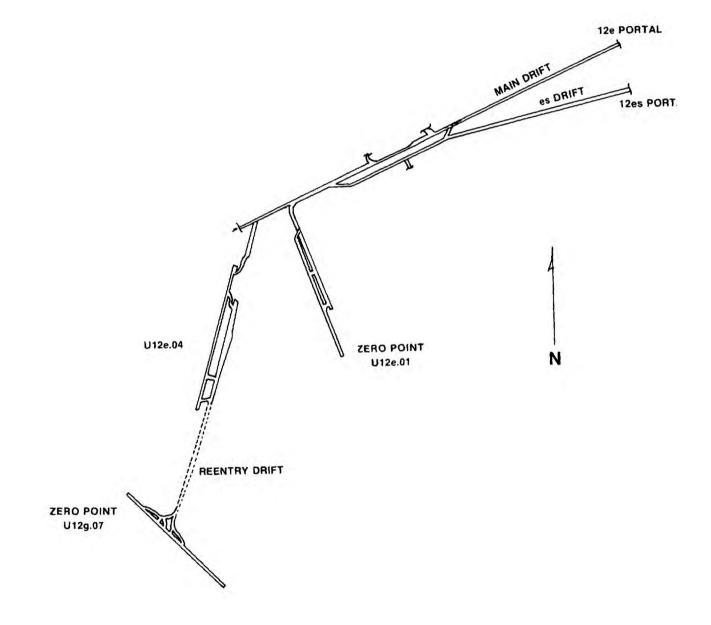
DOOR MIST event - planned reentry through Ul2e.04.
